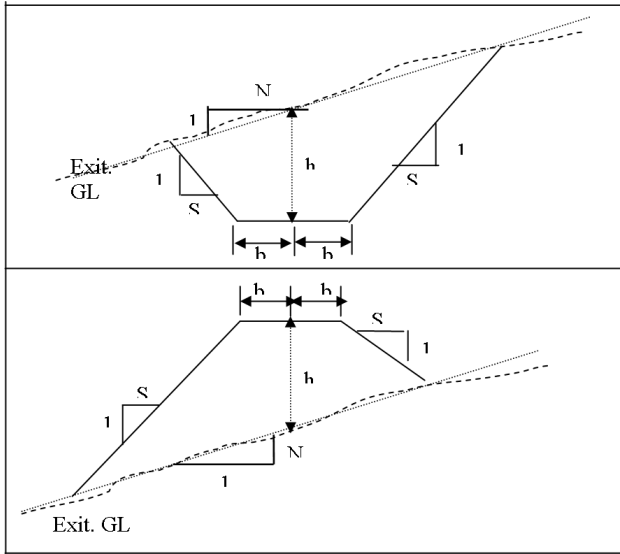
Typical section of road cross-section for irregular cutting terrain surface.
